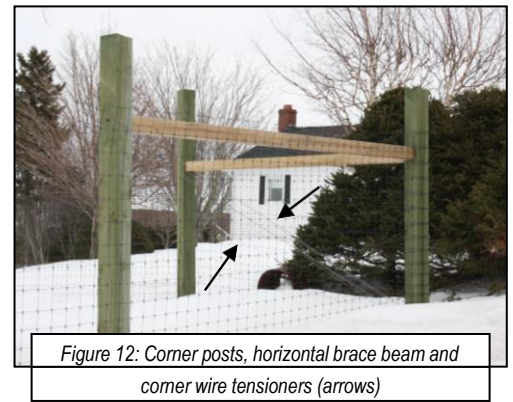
Corner posts, horizontal brace beam and corner wire tensioners (arrows)
